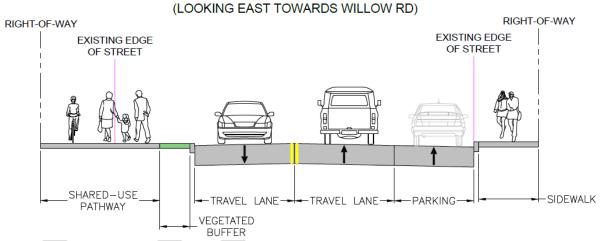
Coleman Avenue (City of Menlo Park) Preferred Long-term Alternative Cross Section Bicycle Boulevard with Shared Use Pathway and Parking on One Side
